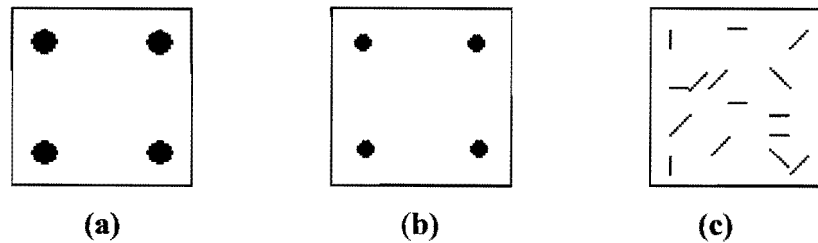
Cross-Section of Columns: (a) #8 Steel-Reinforcement; (b) #4 Steel-Reinforcement; and (c) Fiberglass-Reinforcement
